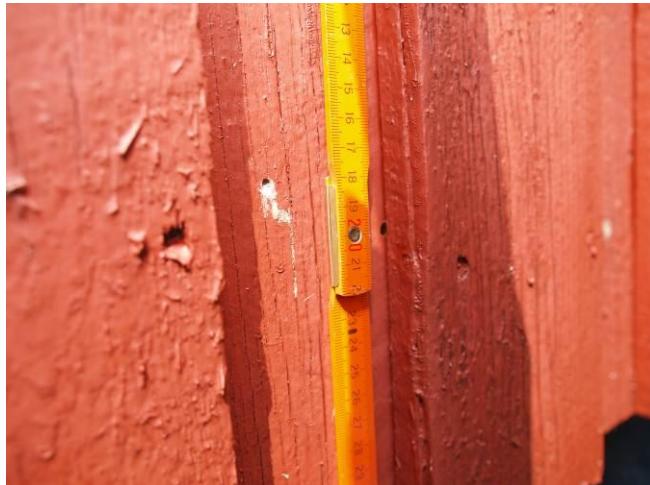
Exit holes of the Old House Borer on the house exterior wall boarding
